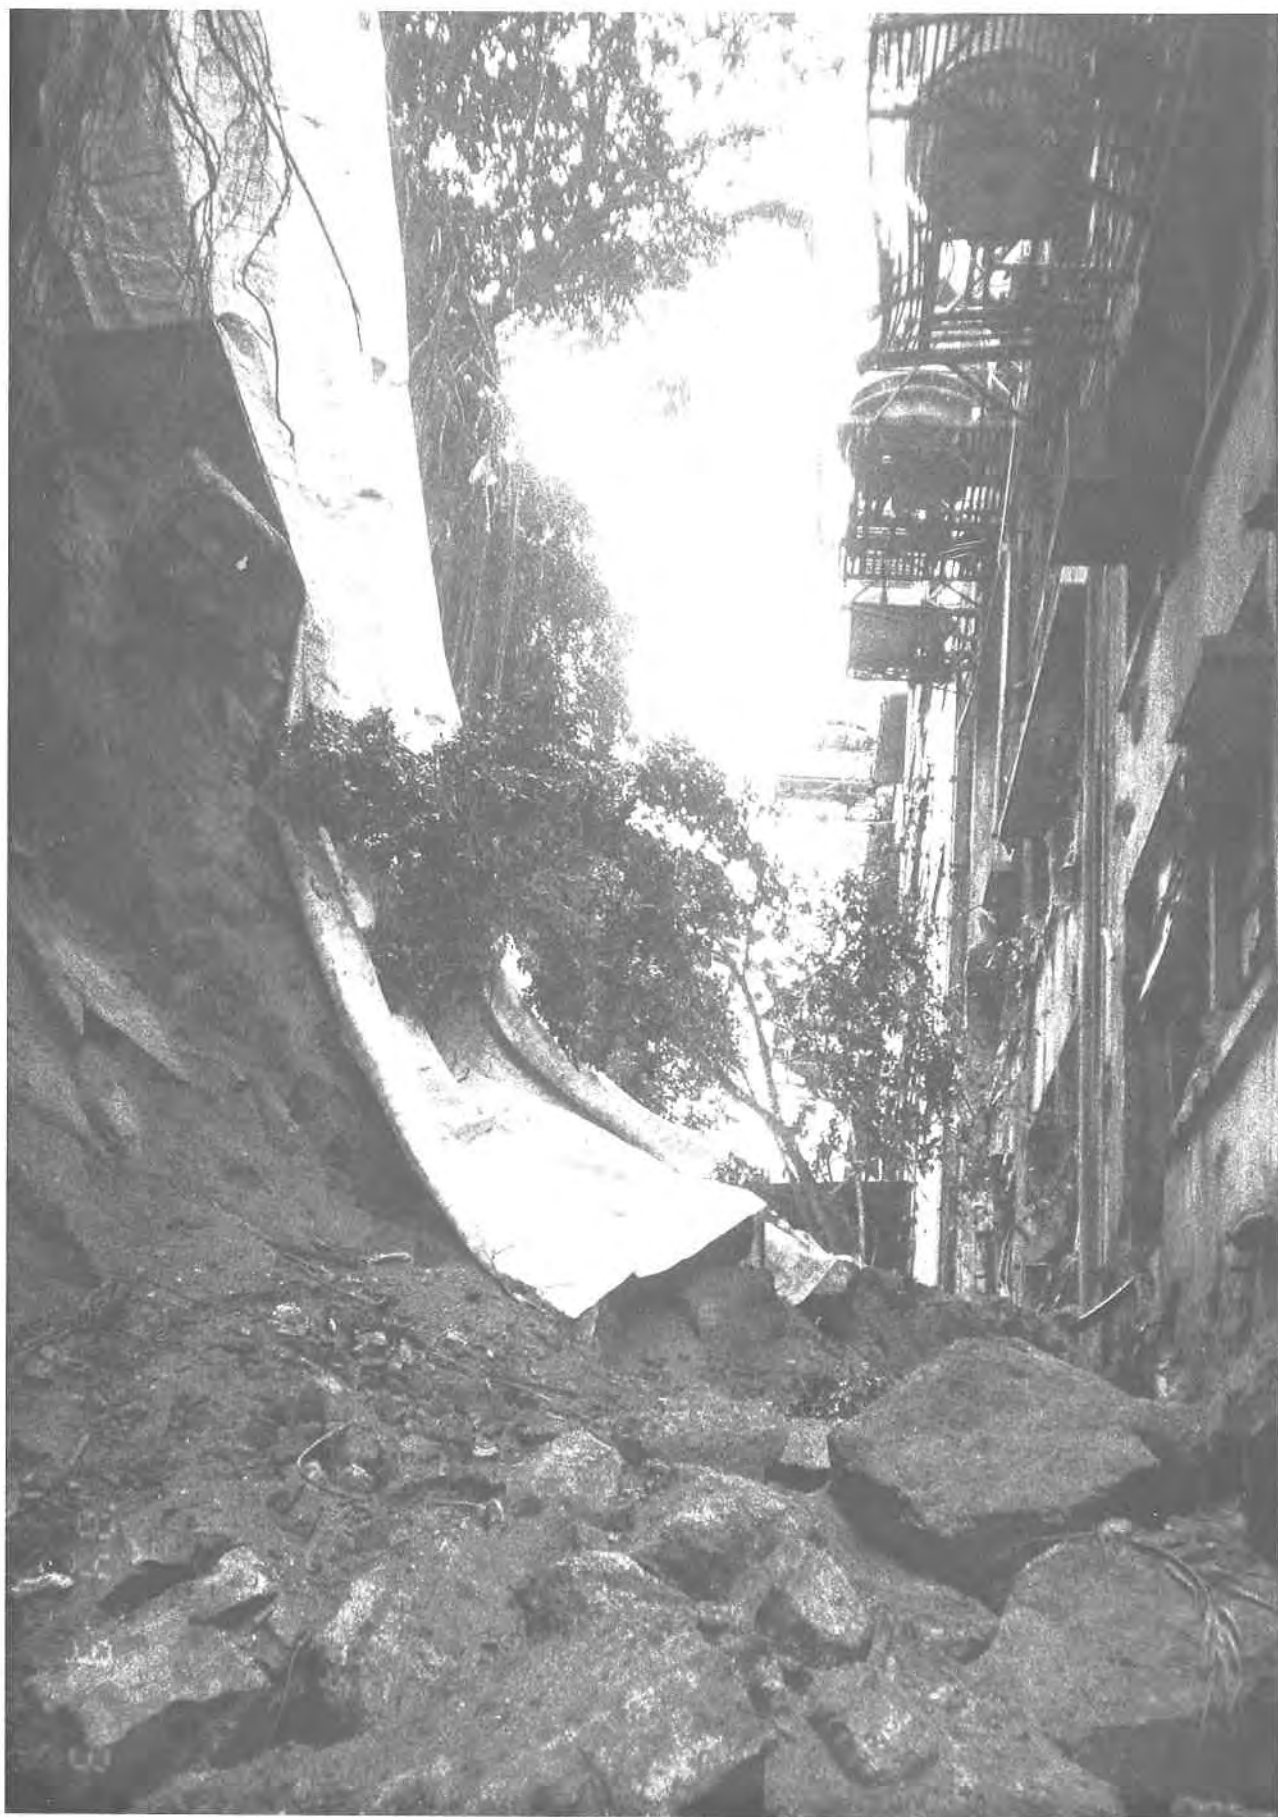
Landslip at Pak Tin in 1983.* This failure resulted from the collapse of a 5 m high masonry retaining wall. The landslide debris blocked a Water Supplies Department access road. (GCO/1983/83/150/13).
